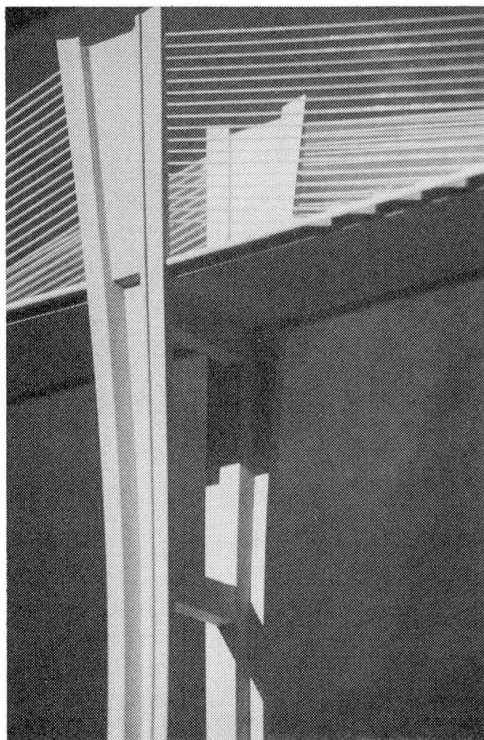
Model of flexurally stiff, low tower for cable-stayed bridges (no backstay cables required)
